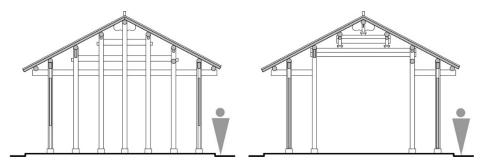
Cross-section drawn of Wu Qianzhen Residence. Photo by author.
